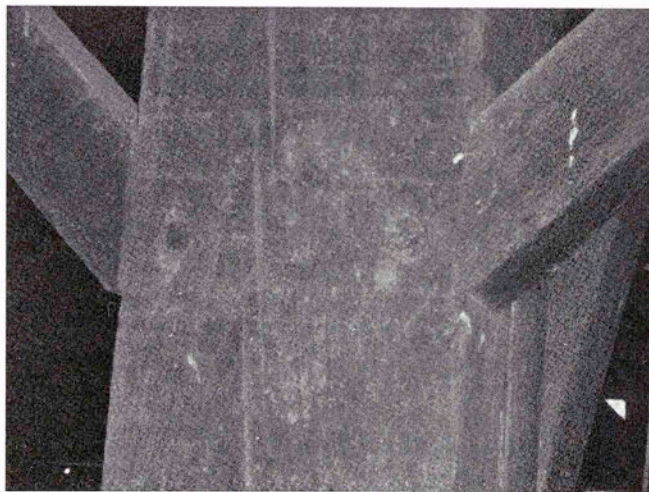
Mortise- and- tenon joint with treenails in Bollenbach's barn located in Dover. (Photo by Lynda Ramsey)
